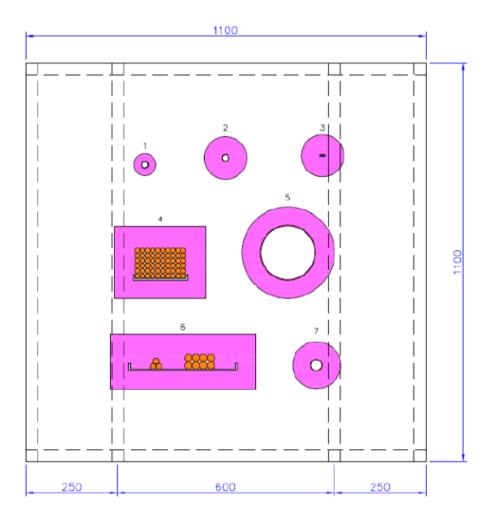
Plan view of service penetrations in test report FSP 1833. Specimens 2, 4, 5, 6 and 7 were installed with the BOSS P40-Mak Wrap
